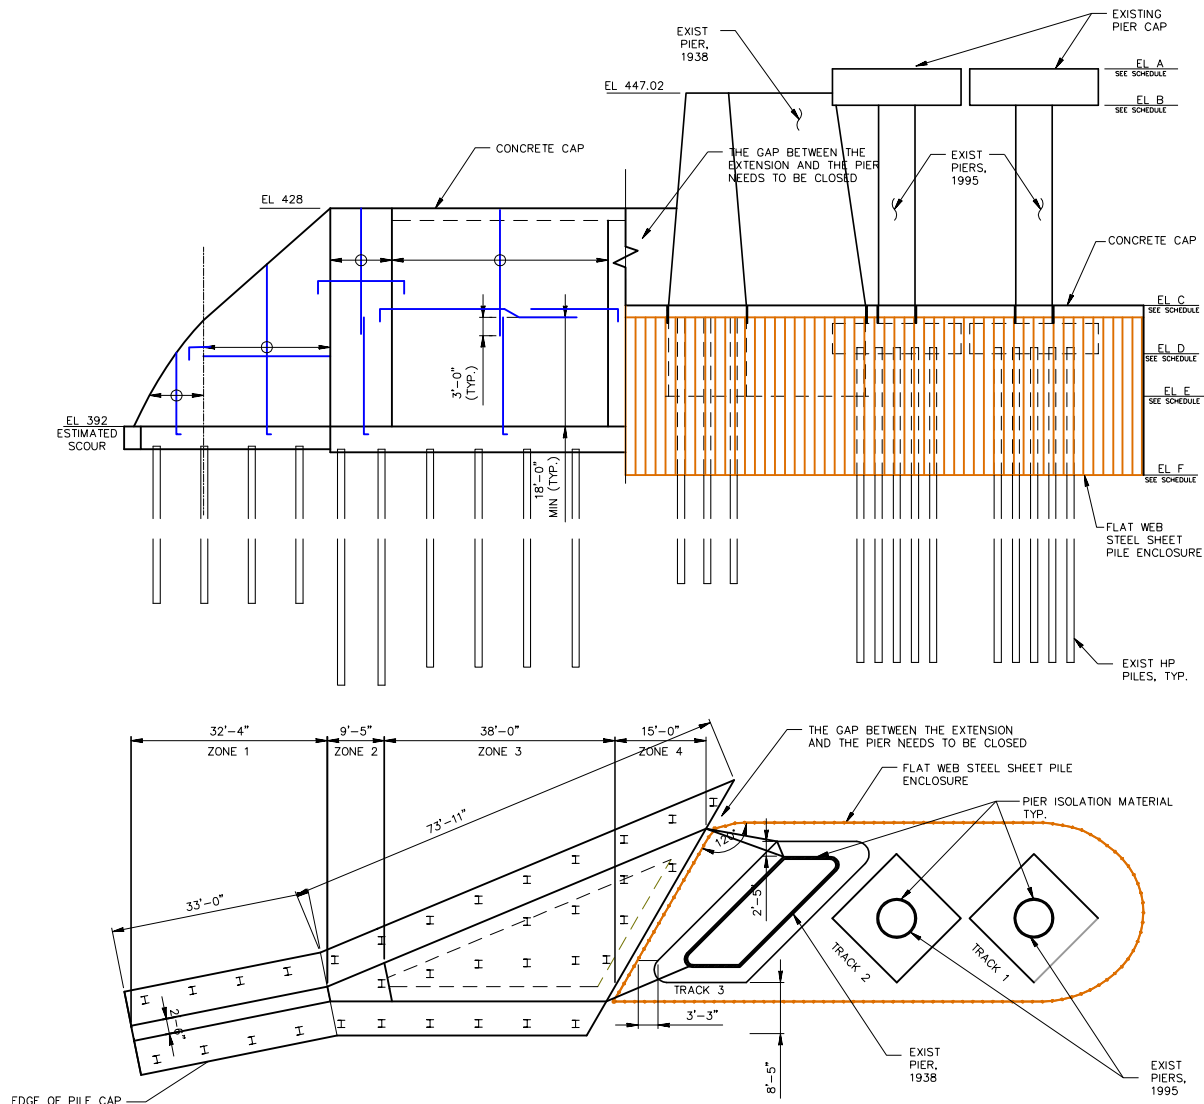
Recommended Bridge Pier Extension Configuration – Side and Top Views
